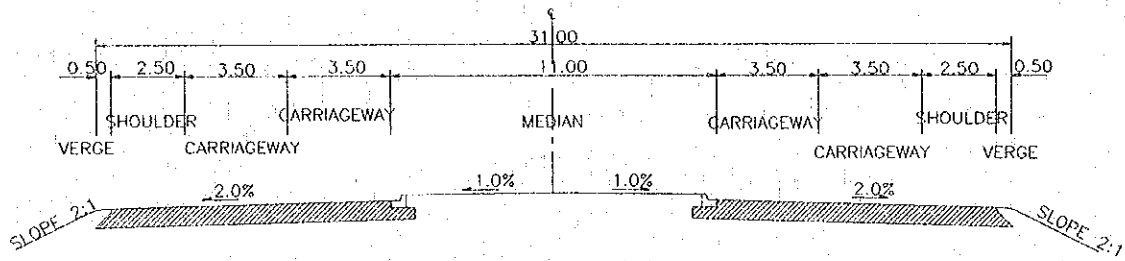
Typical Cross-section of the Connecting Road on the Thailand
